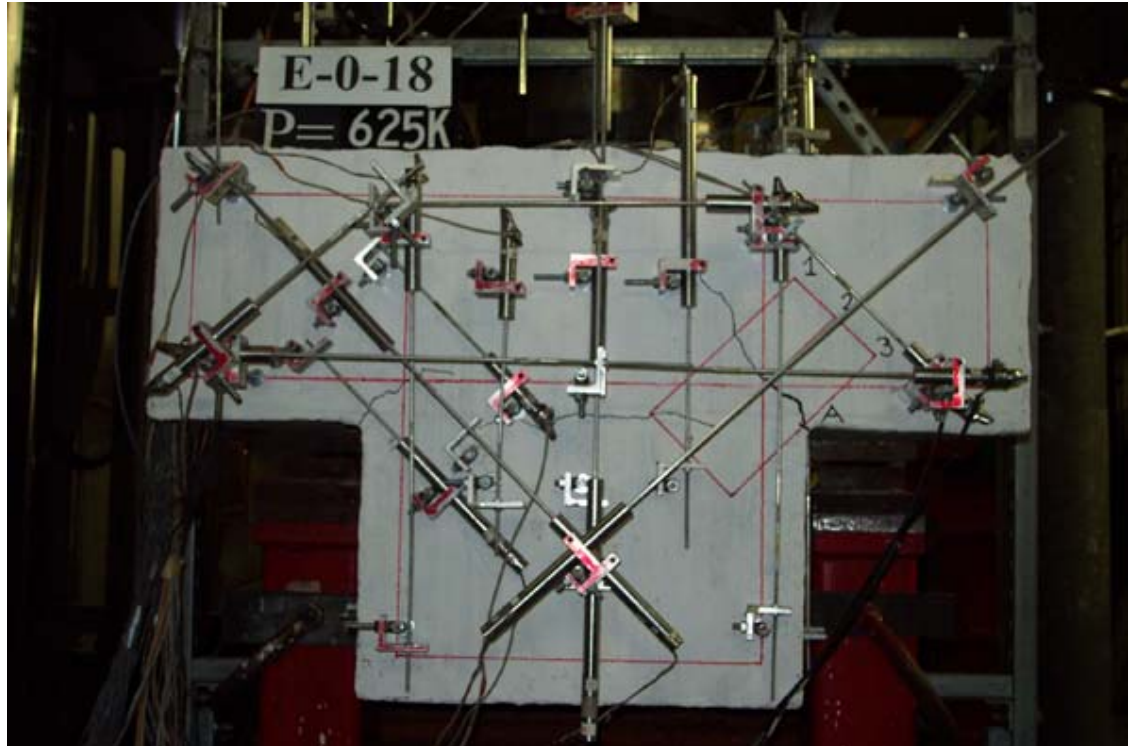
(d) Diagonal and horizontal cracks in Specimen E-0-18
